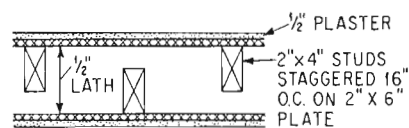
A cross section of a sound-insulating partition. Wooden walls should be constructed in this manner to reduce external noise.
